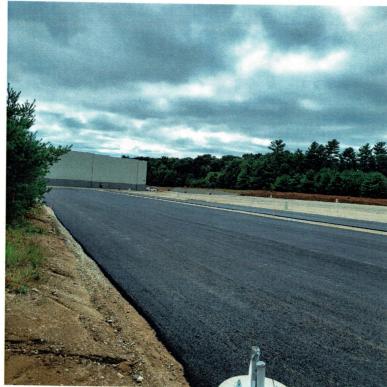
General overview of northern parking area partially paved with binder course pavement.
